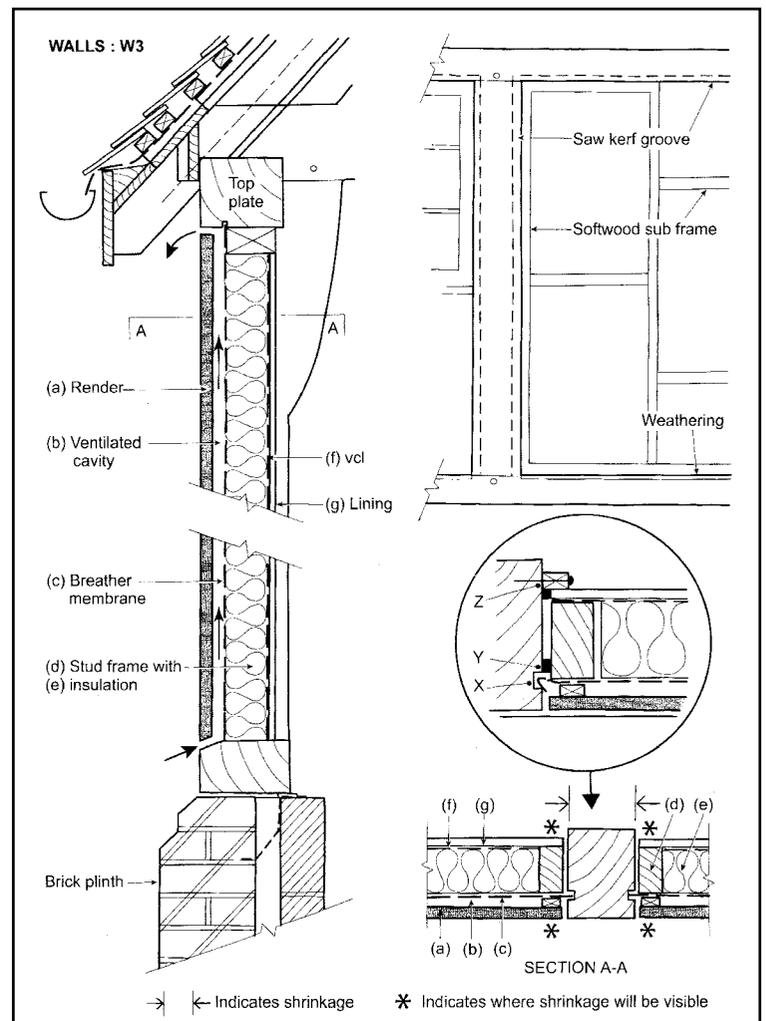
Green Oak Figure 7.43, "Wall Construction in plane of frame," specifications for one system of infilling timber frame wall, with appropriate warnings about shrinkage and direct air infiltration.
